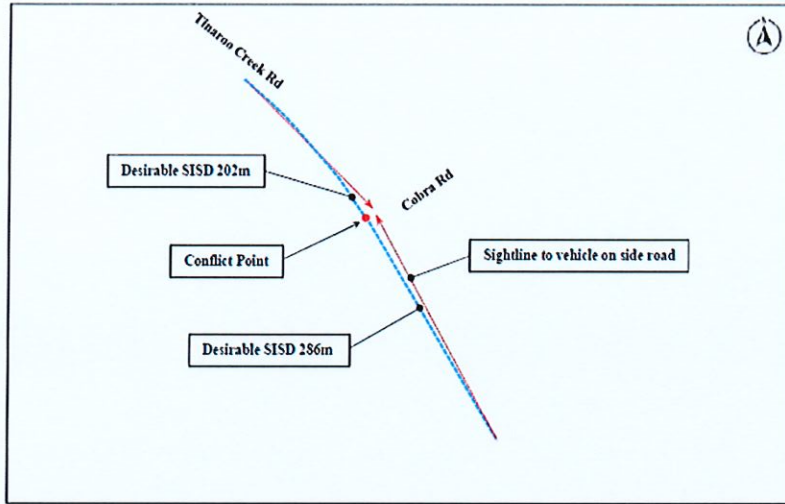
Tinaroo Creek Road/Cobra Road Intersection - SISD Assessment
